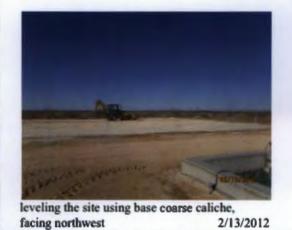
Photographic record of soil excavation and installation of double synthetic liner system.
